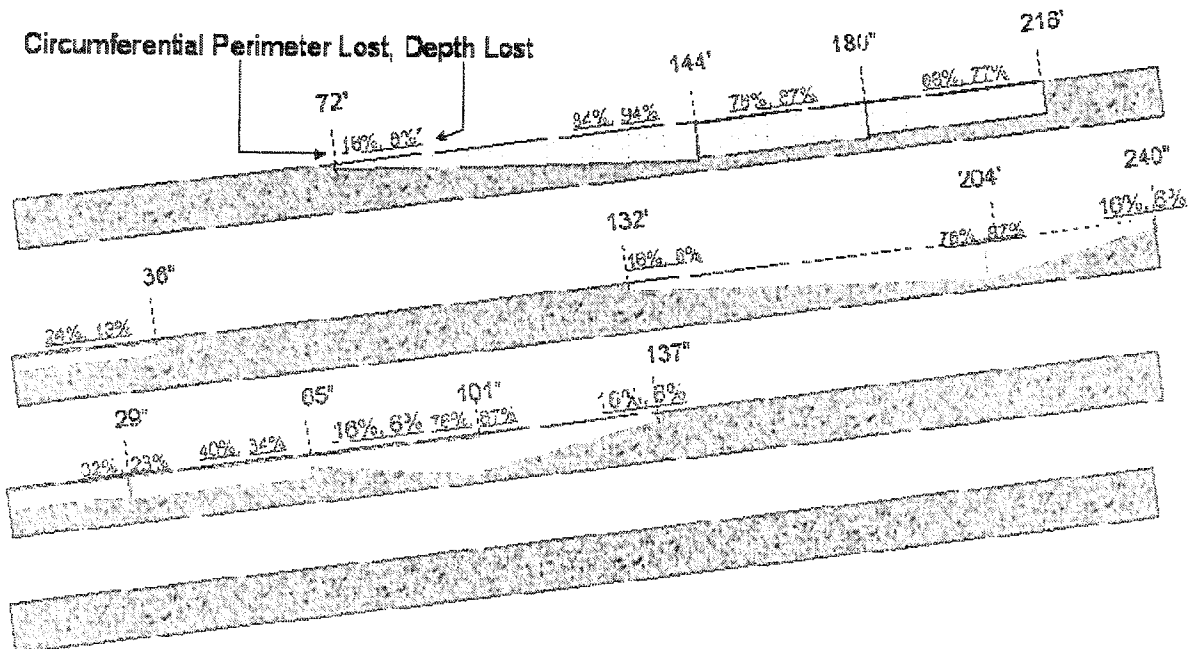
Design Grout Defects in the South Wall in 4 inch (101.6 mm) Metal Ducts
